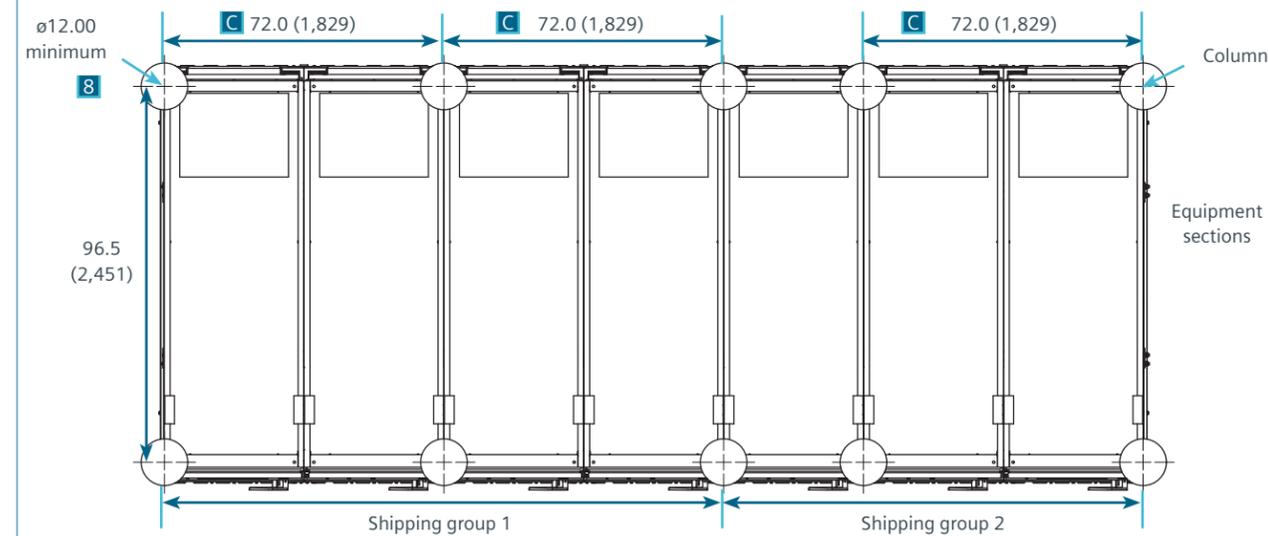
Anchoring outdoor type OGM-SG non-walk-in switchgear (continued)
